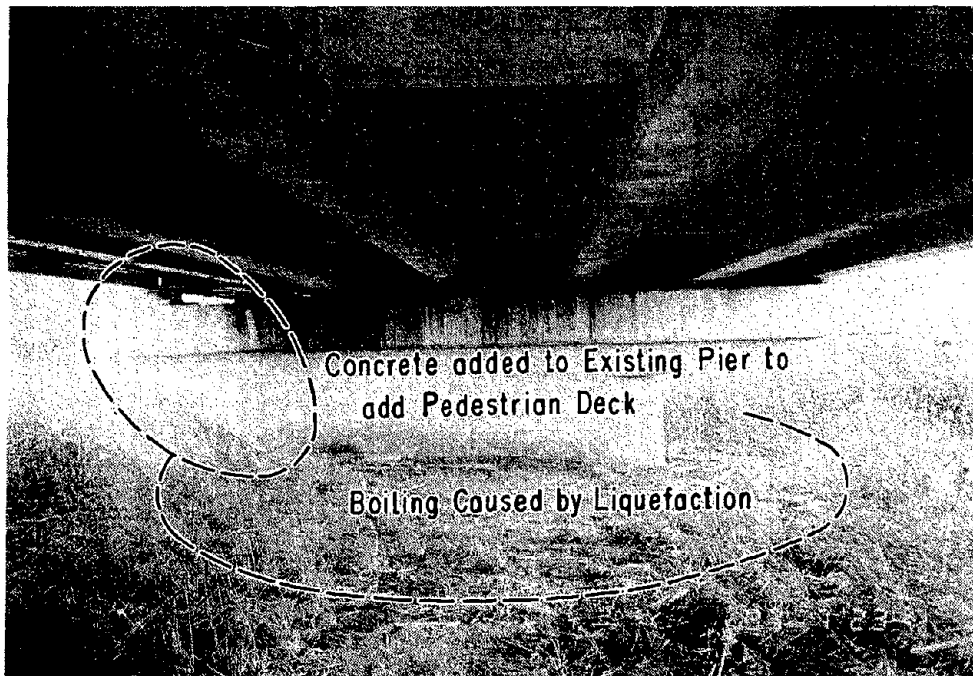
Inclination of Pire and soil Liquefaction (Osyamanbe Bridge, Pier P2)
